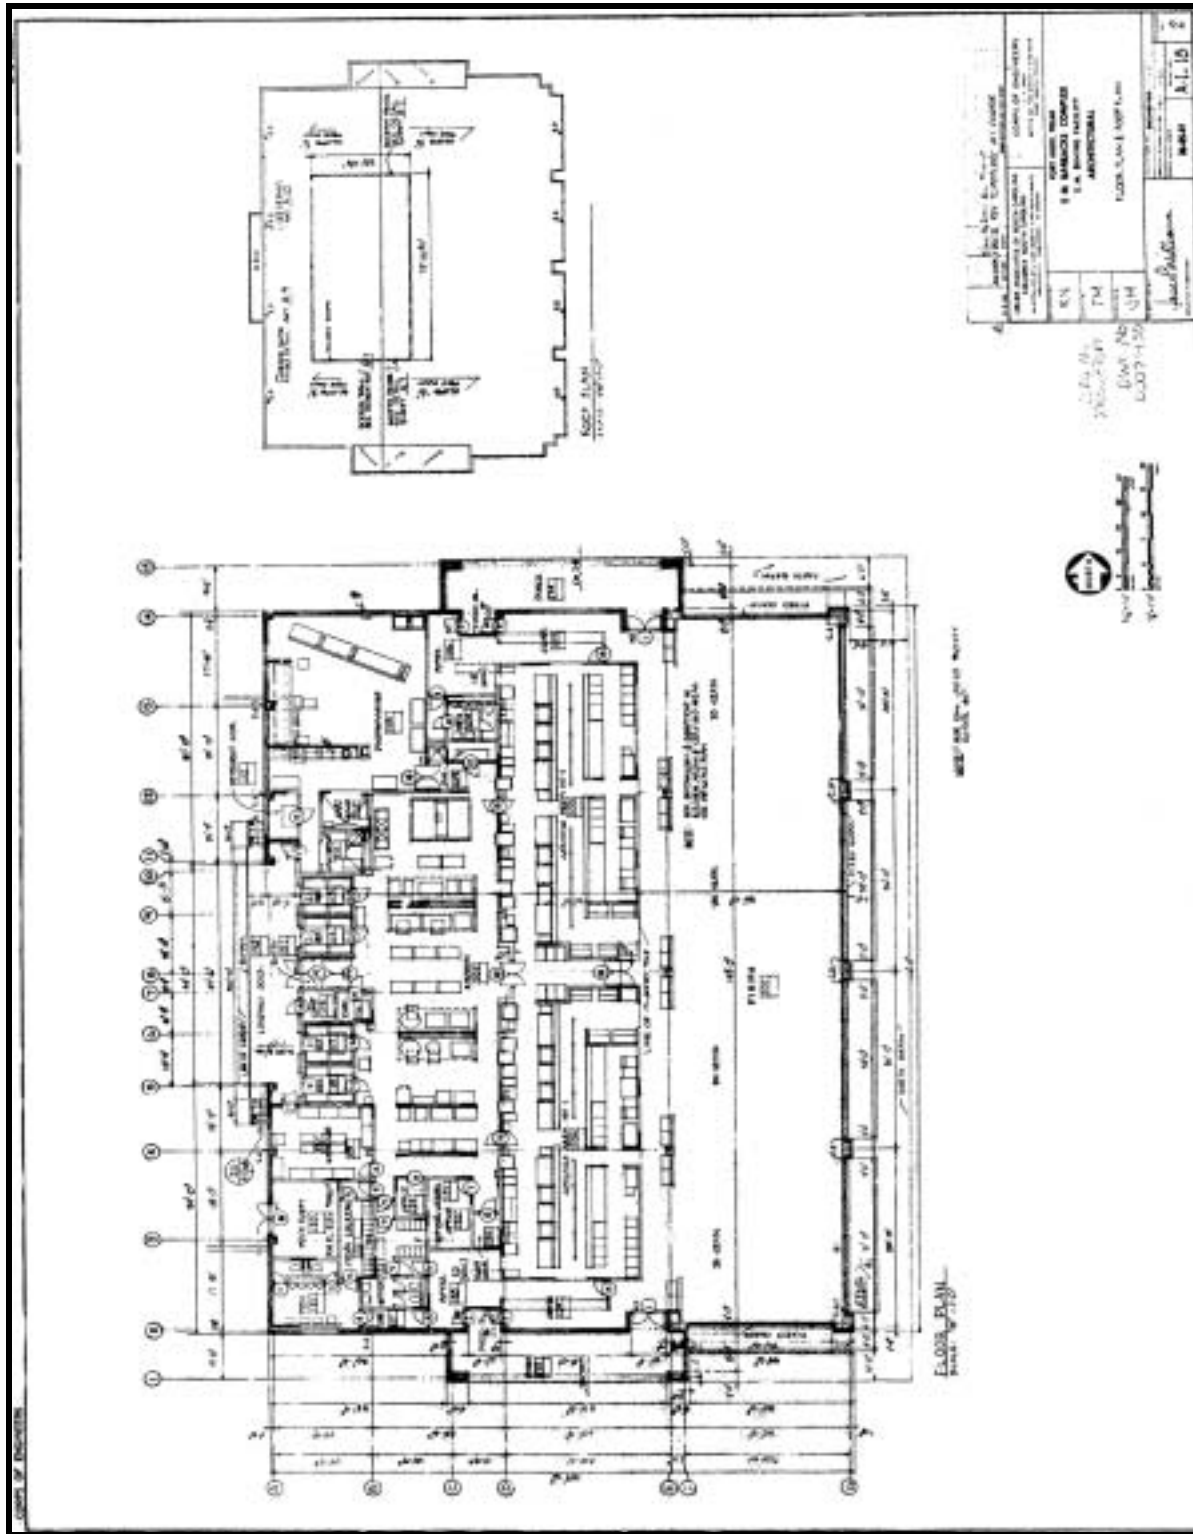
Double LBC&W dining facility, floor plan, Ft. Hood (1972, revised 1975) (Engineering, Ft. Hood).
